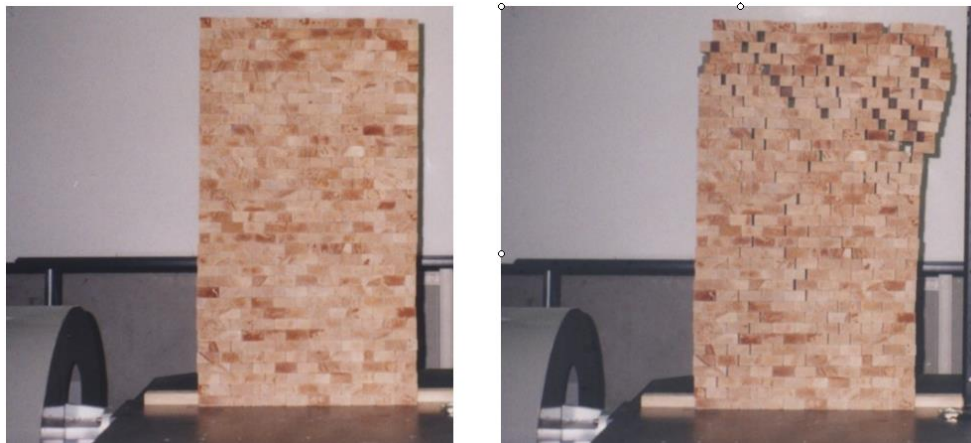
Views of the wall with 30 layers of wooden blocks before and after shaking
